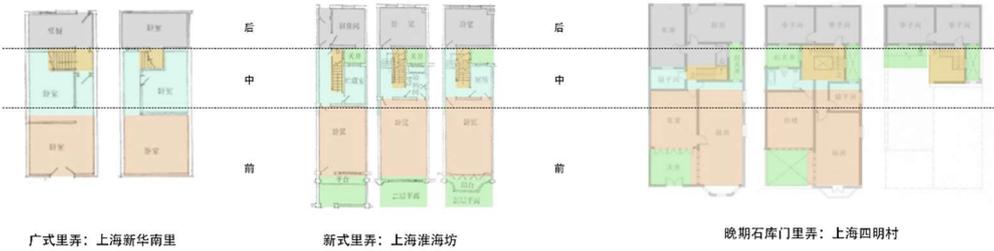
Horizontal comparison of the spatial layout of Cantonese-style Lilong, New-style Lilong and Later Shikumen Lilongs Source: Self-painted
